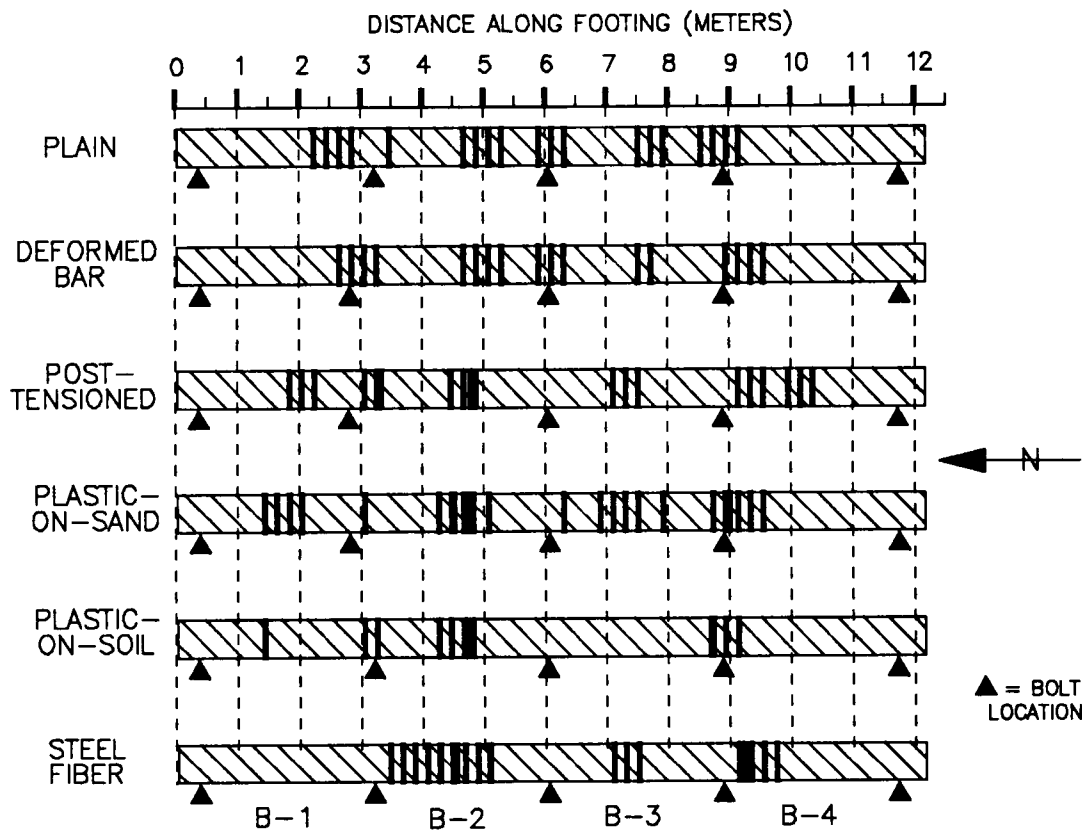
Day 91 Tension Zone Wall Crack - Extensometer Segment Location
